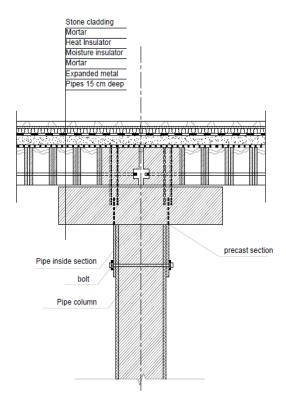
Precast slab from pipes. Section A-A Source: Designed and drawn by the author
